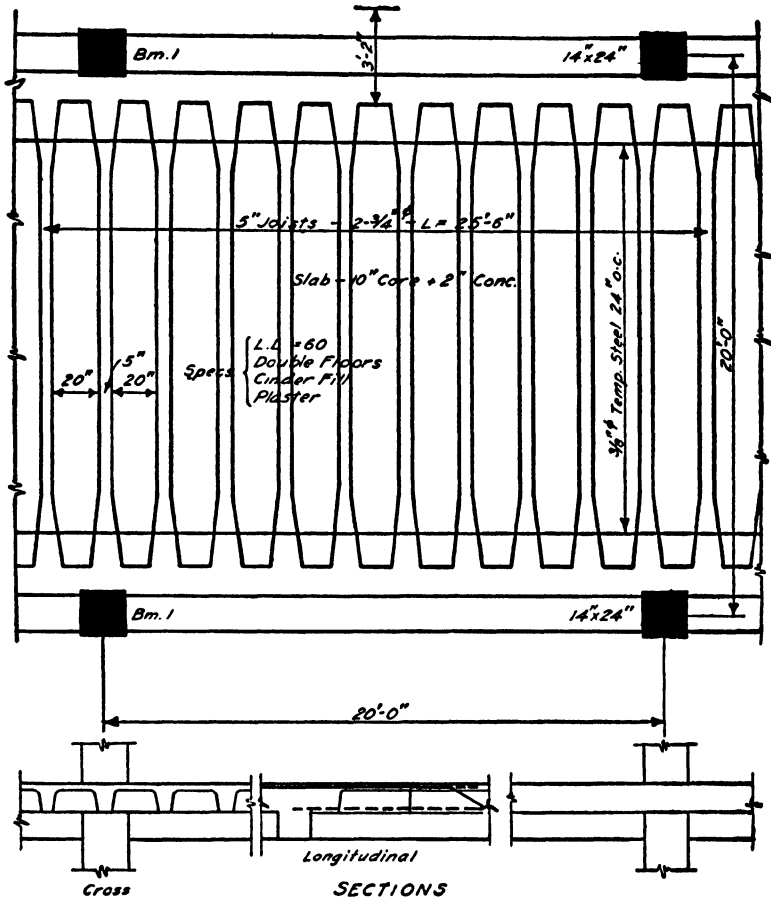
Framing for One-Way Metal Pan Ribbed Slab in Concrete Frame.
